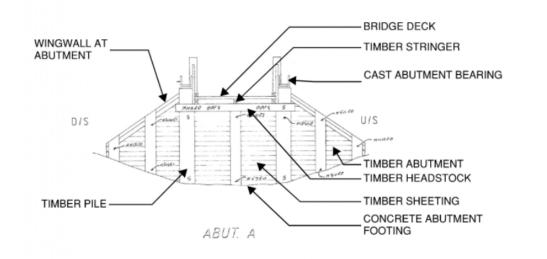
Illustration of Technical Terminology Used in This CMP – Bridge Deck Plan and Elevation
